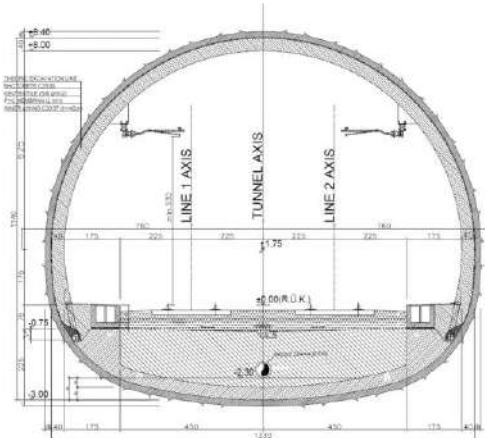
Typical cross section of the T1 tunnel (units are in cm).
